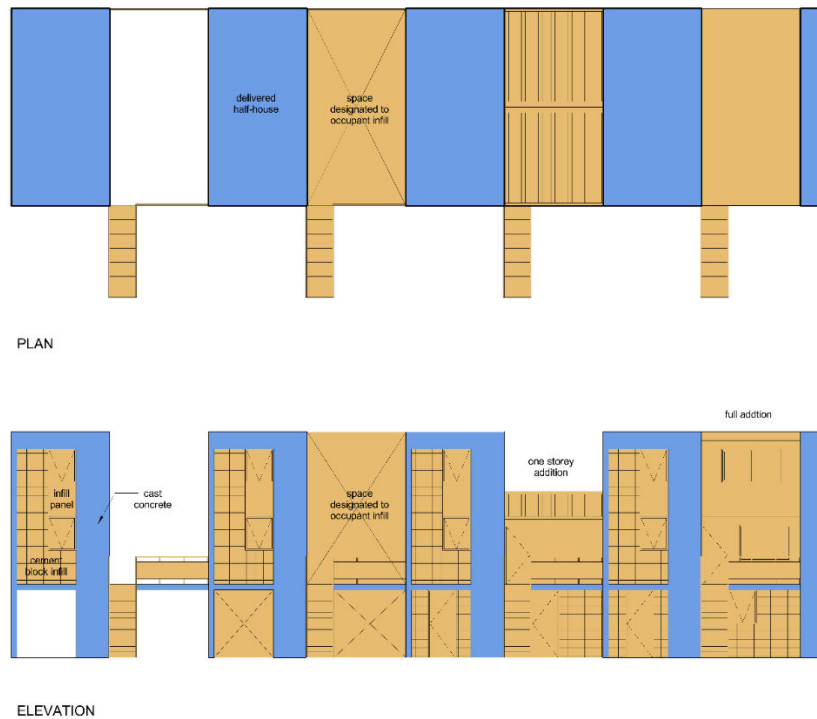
Plan and elevation of Half a House illustrating the delivered structure in blue and the intended additions and adaptations in orange. By author, 2022.
